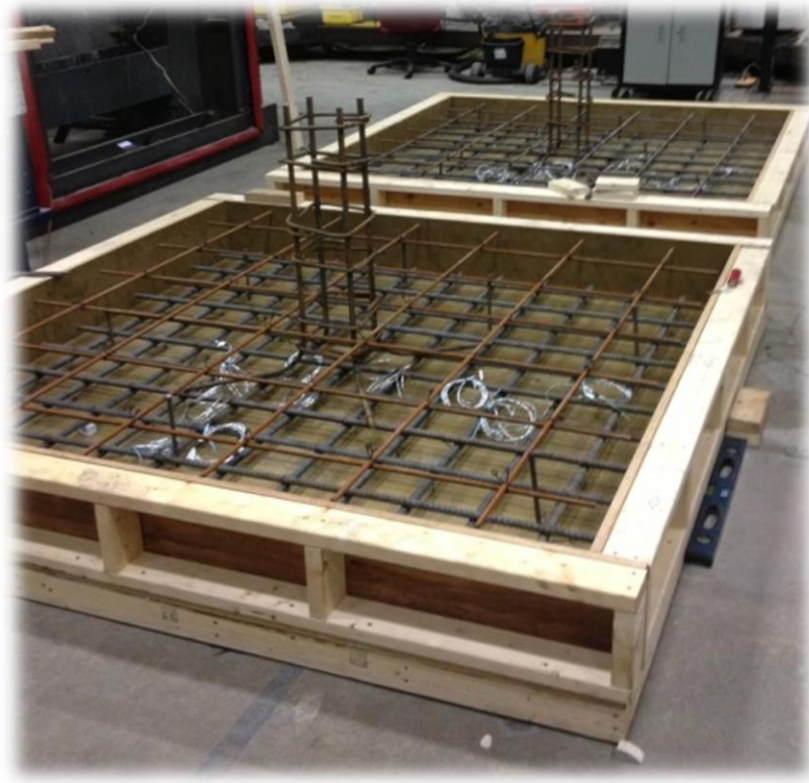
Wooden Formwork for Casting the 200 mm & 250 mm Thick Slabs
